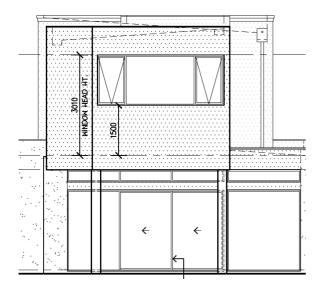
Sill height of window to Master Bed as portrayed on north elevation
